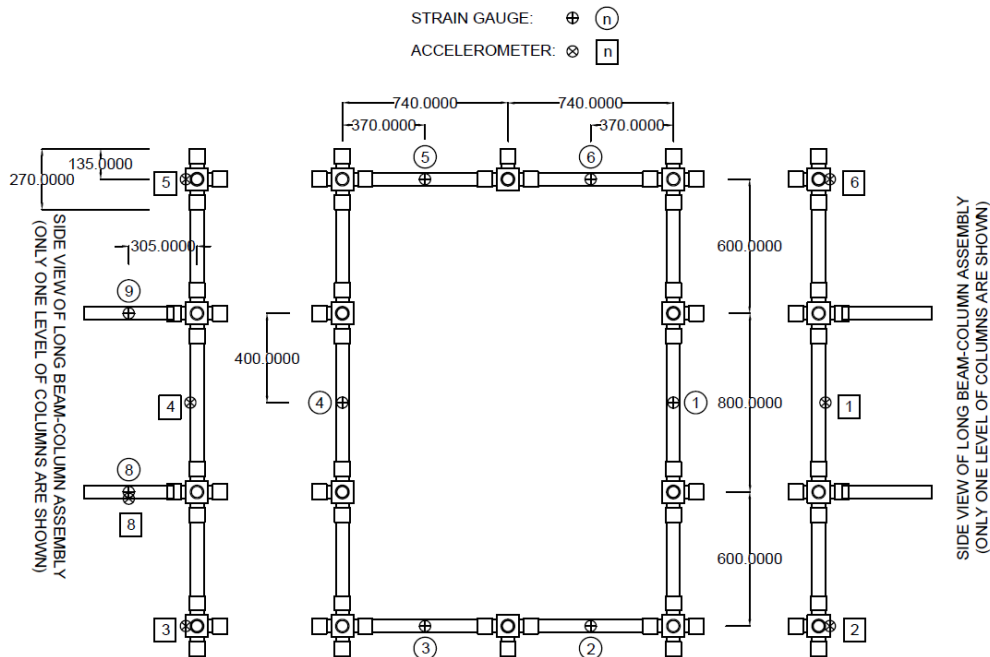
Plan of structural frame with the location of sensors (all dimensions are in mm)
